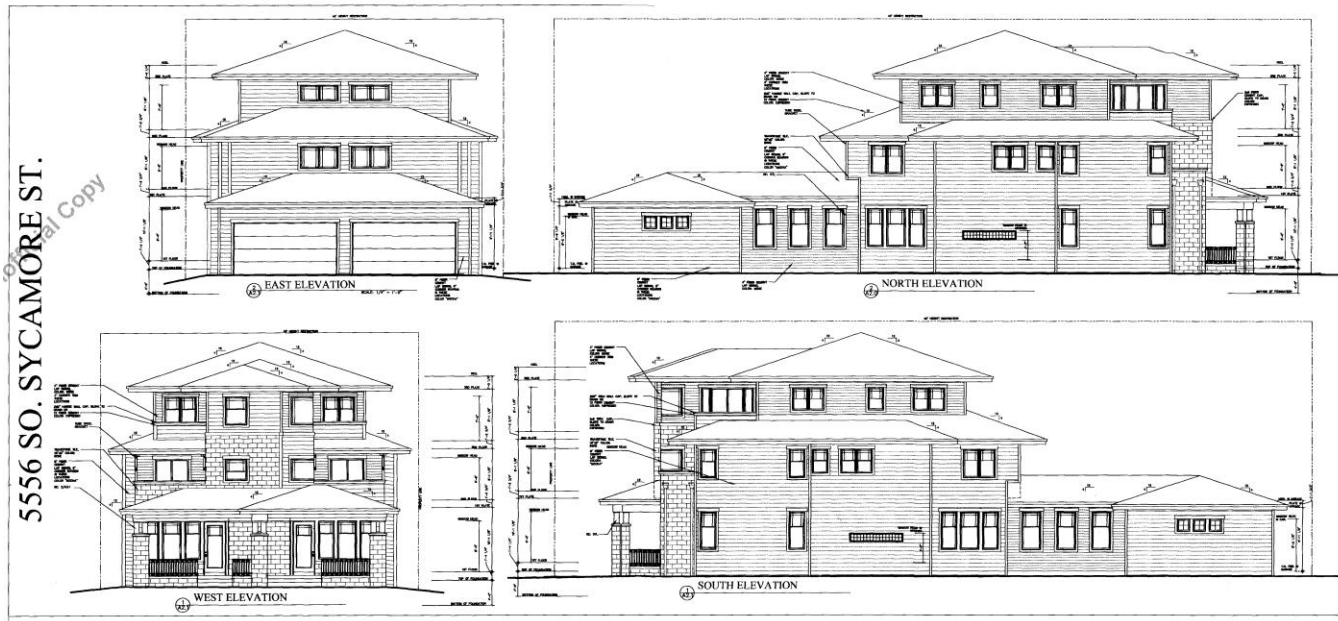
Proposed Sketch Plan With Highlighted Change Locations (West and North Elevations)
